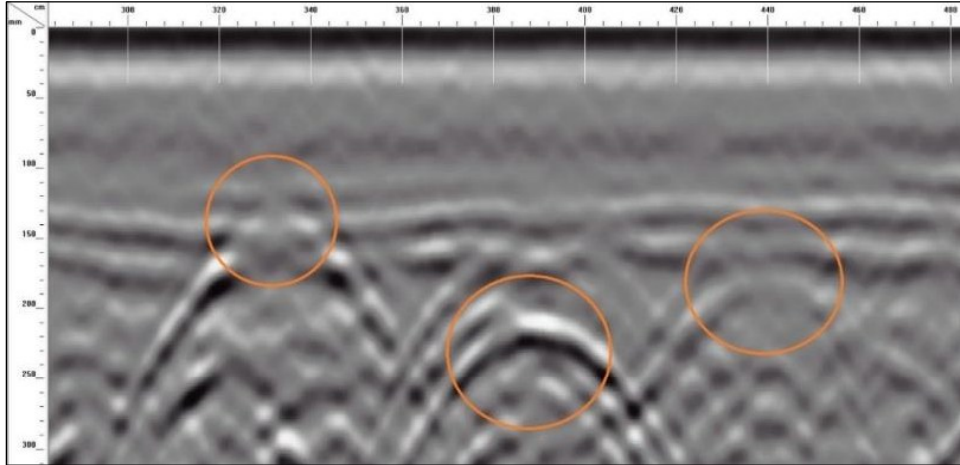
Sectional profile showing reflections of PVC pipes buried under the existing pavement
